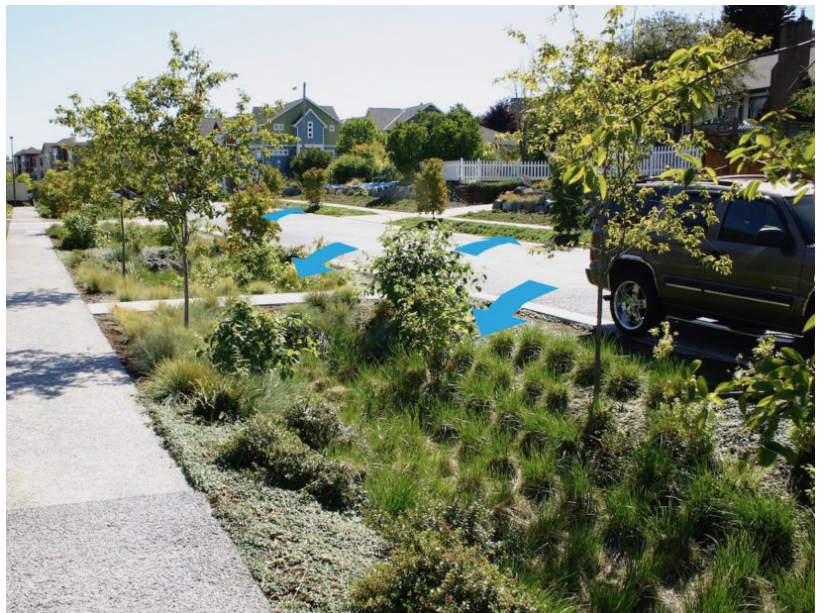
Vegetated infiltration basin or rain garden between street and sidewalk harvests runoff from the street, Seattle, Washington. (Source: Rainwater Harvesting for Drylands and Beyond)
